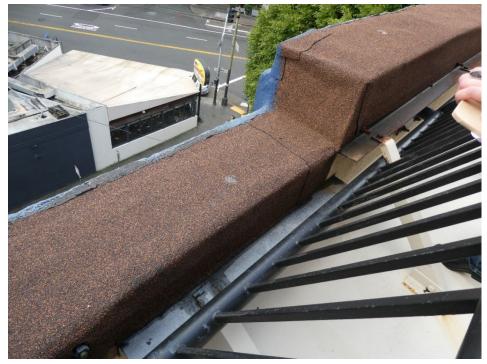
Some deterioration of the seams at the asphaltic coping at the south parapet wall, fifth floor balcony.
